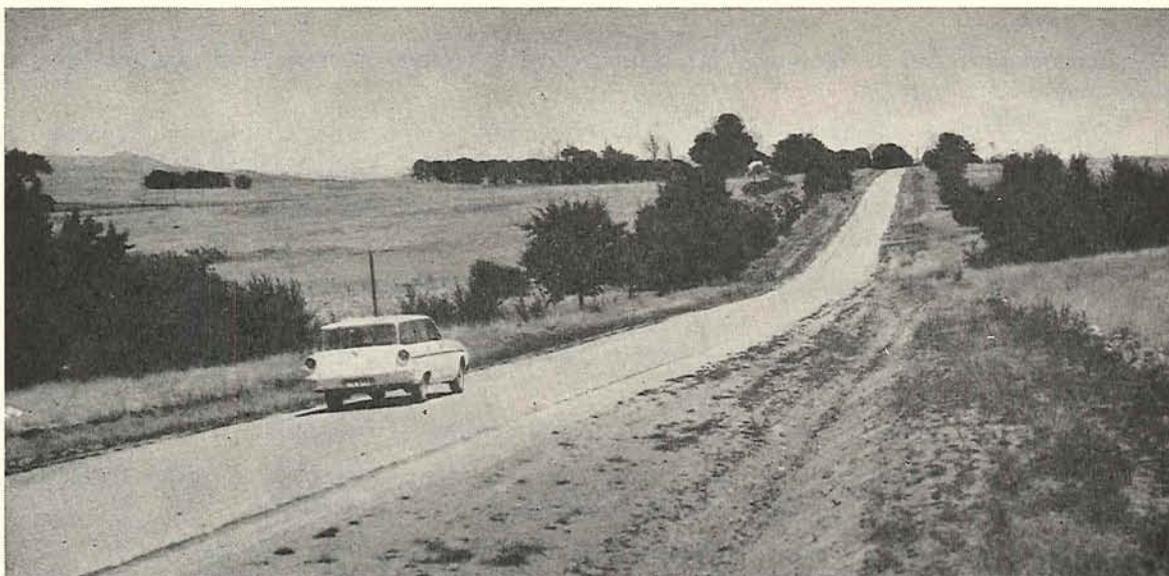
Ripon Shire—Stockyard Hill Road—Reconstructed and realigned section.
